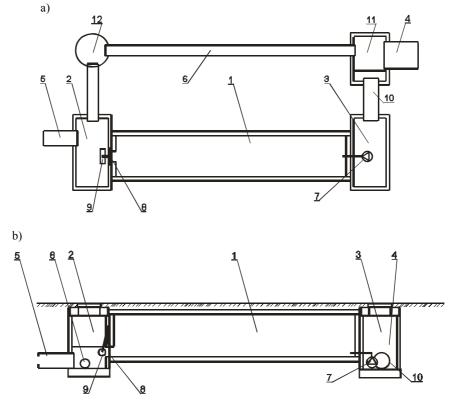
EcoINFRA2* storage reservoir hydraulic scheme: a) horizontal section of reservoir with choking pipe and inflow chamber; b) vertical section of reservoir with choking pipe and
